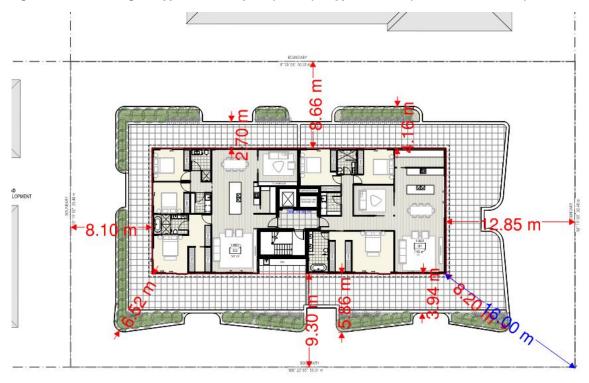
extent of amended upper level floor plate (Level 3) – approx. 316m² (exclusive of the surrounding balcony)
